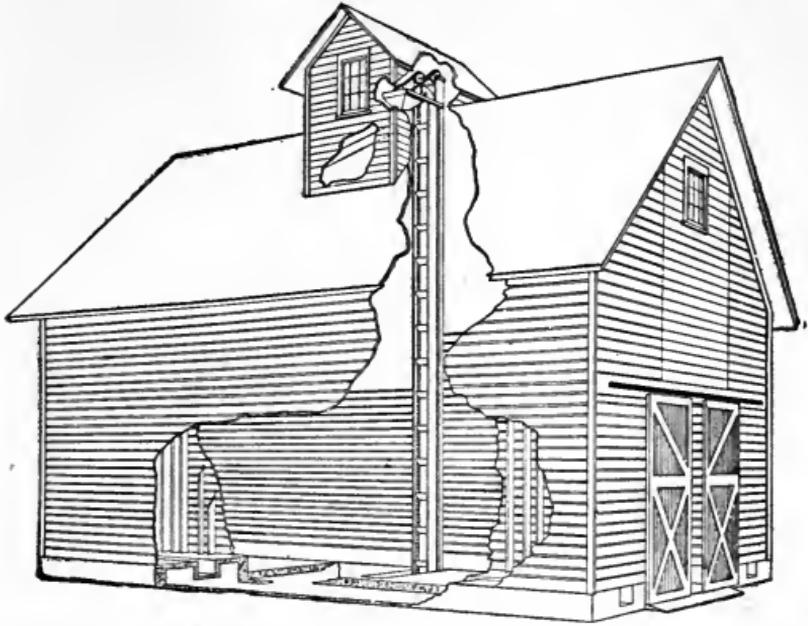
Perspective View of Two-Story Corn Crib. The Side of the Building is Cut Away to Show the Elevating Machinery
